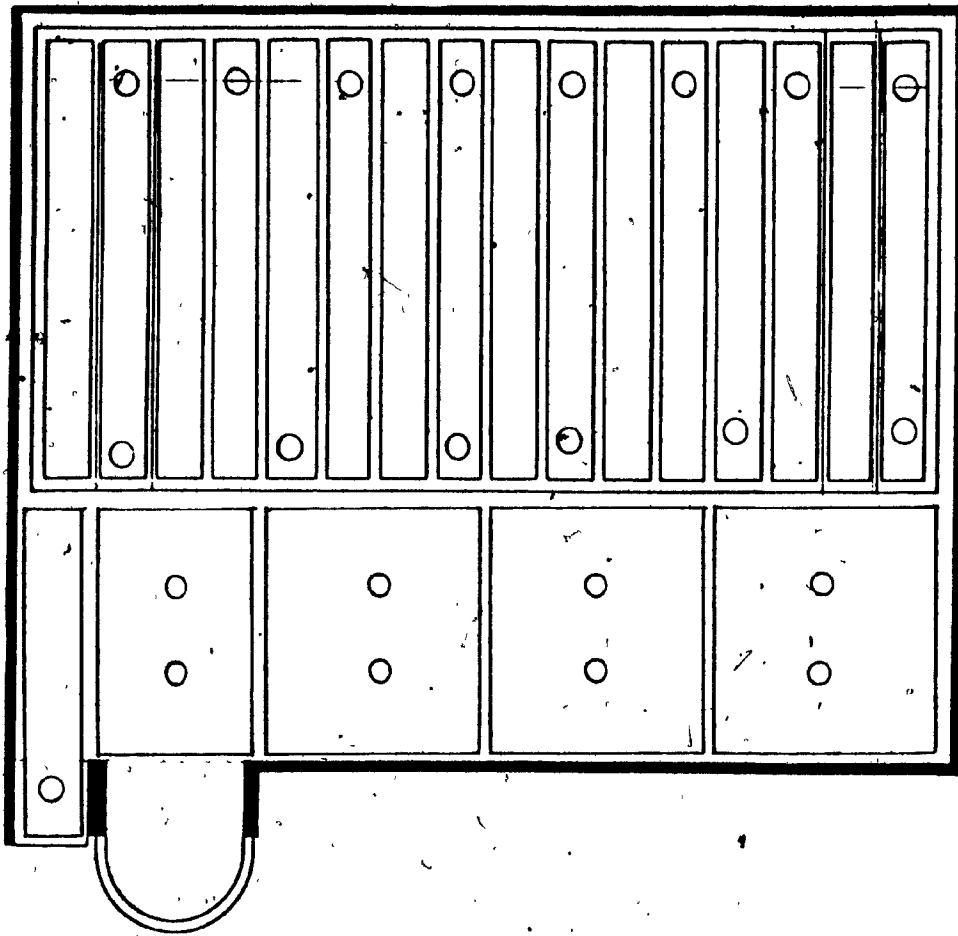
, Reflected ceiling plan of gallery (C).
